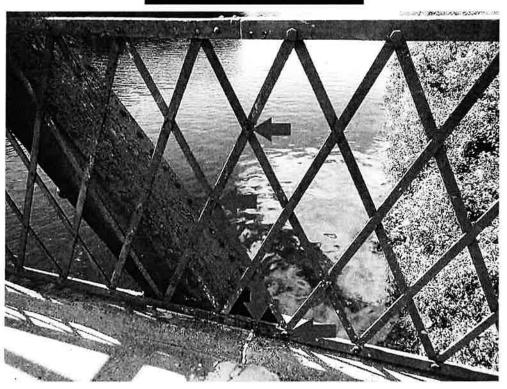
South sidewalk pedestrian railing at L0 - the top and bottom rail splice connections and the lattice members have missing rivets.
